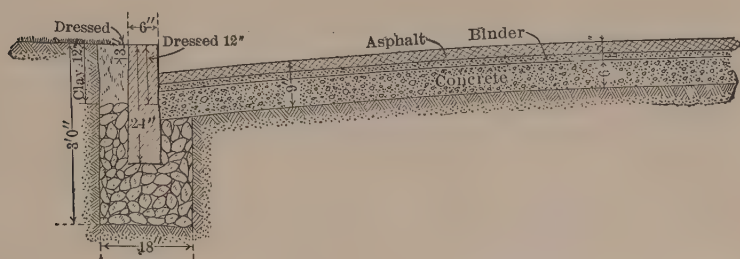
Section Showing Construction of Sheet Asphalt Pavement in Pittsburg, Pa.
